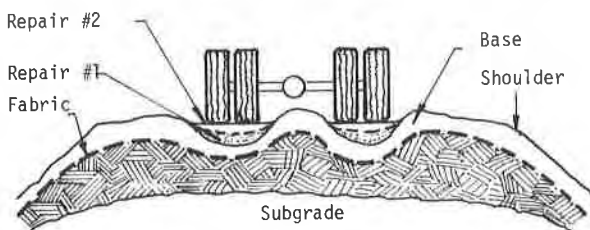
Cross Section of Road with In Situ Tensioned Geotextile.
